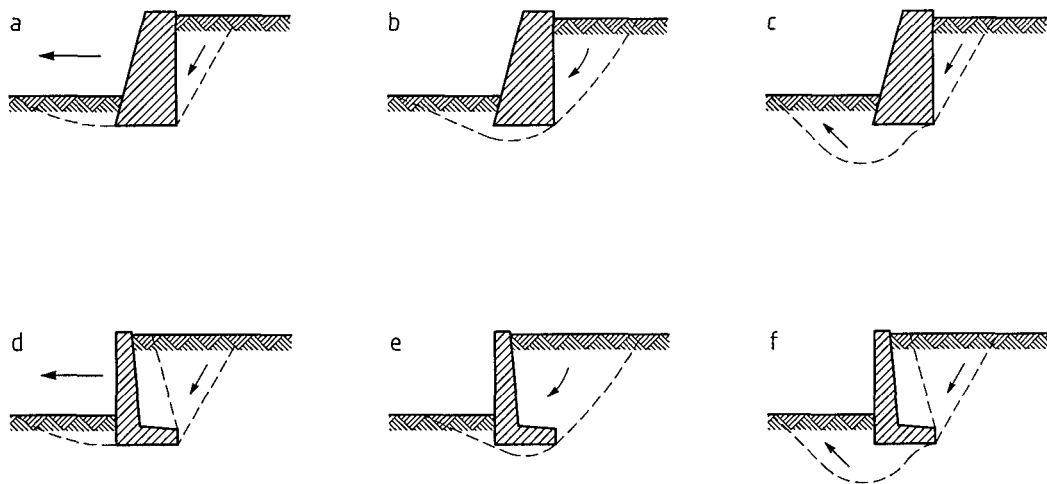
Examples of limit modes for foundation failures of gravity walls (from Eurocode 7)
